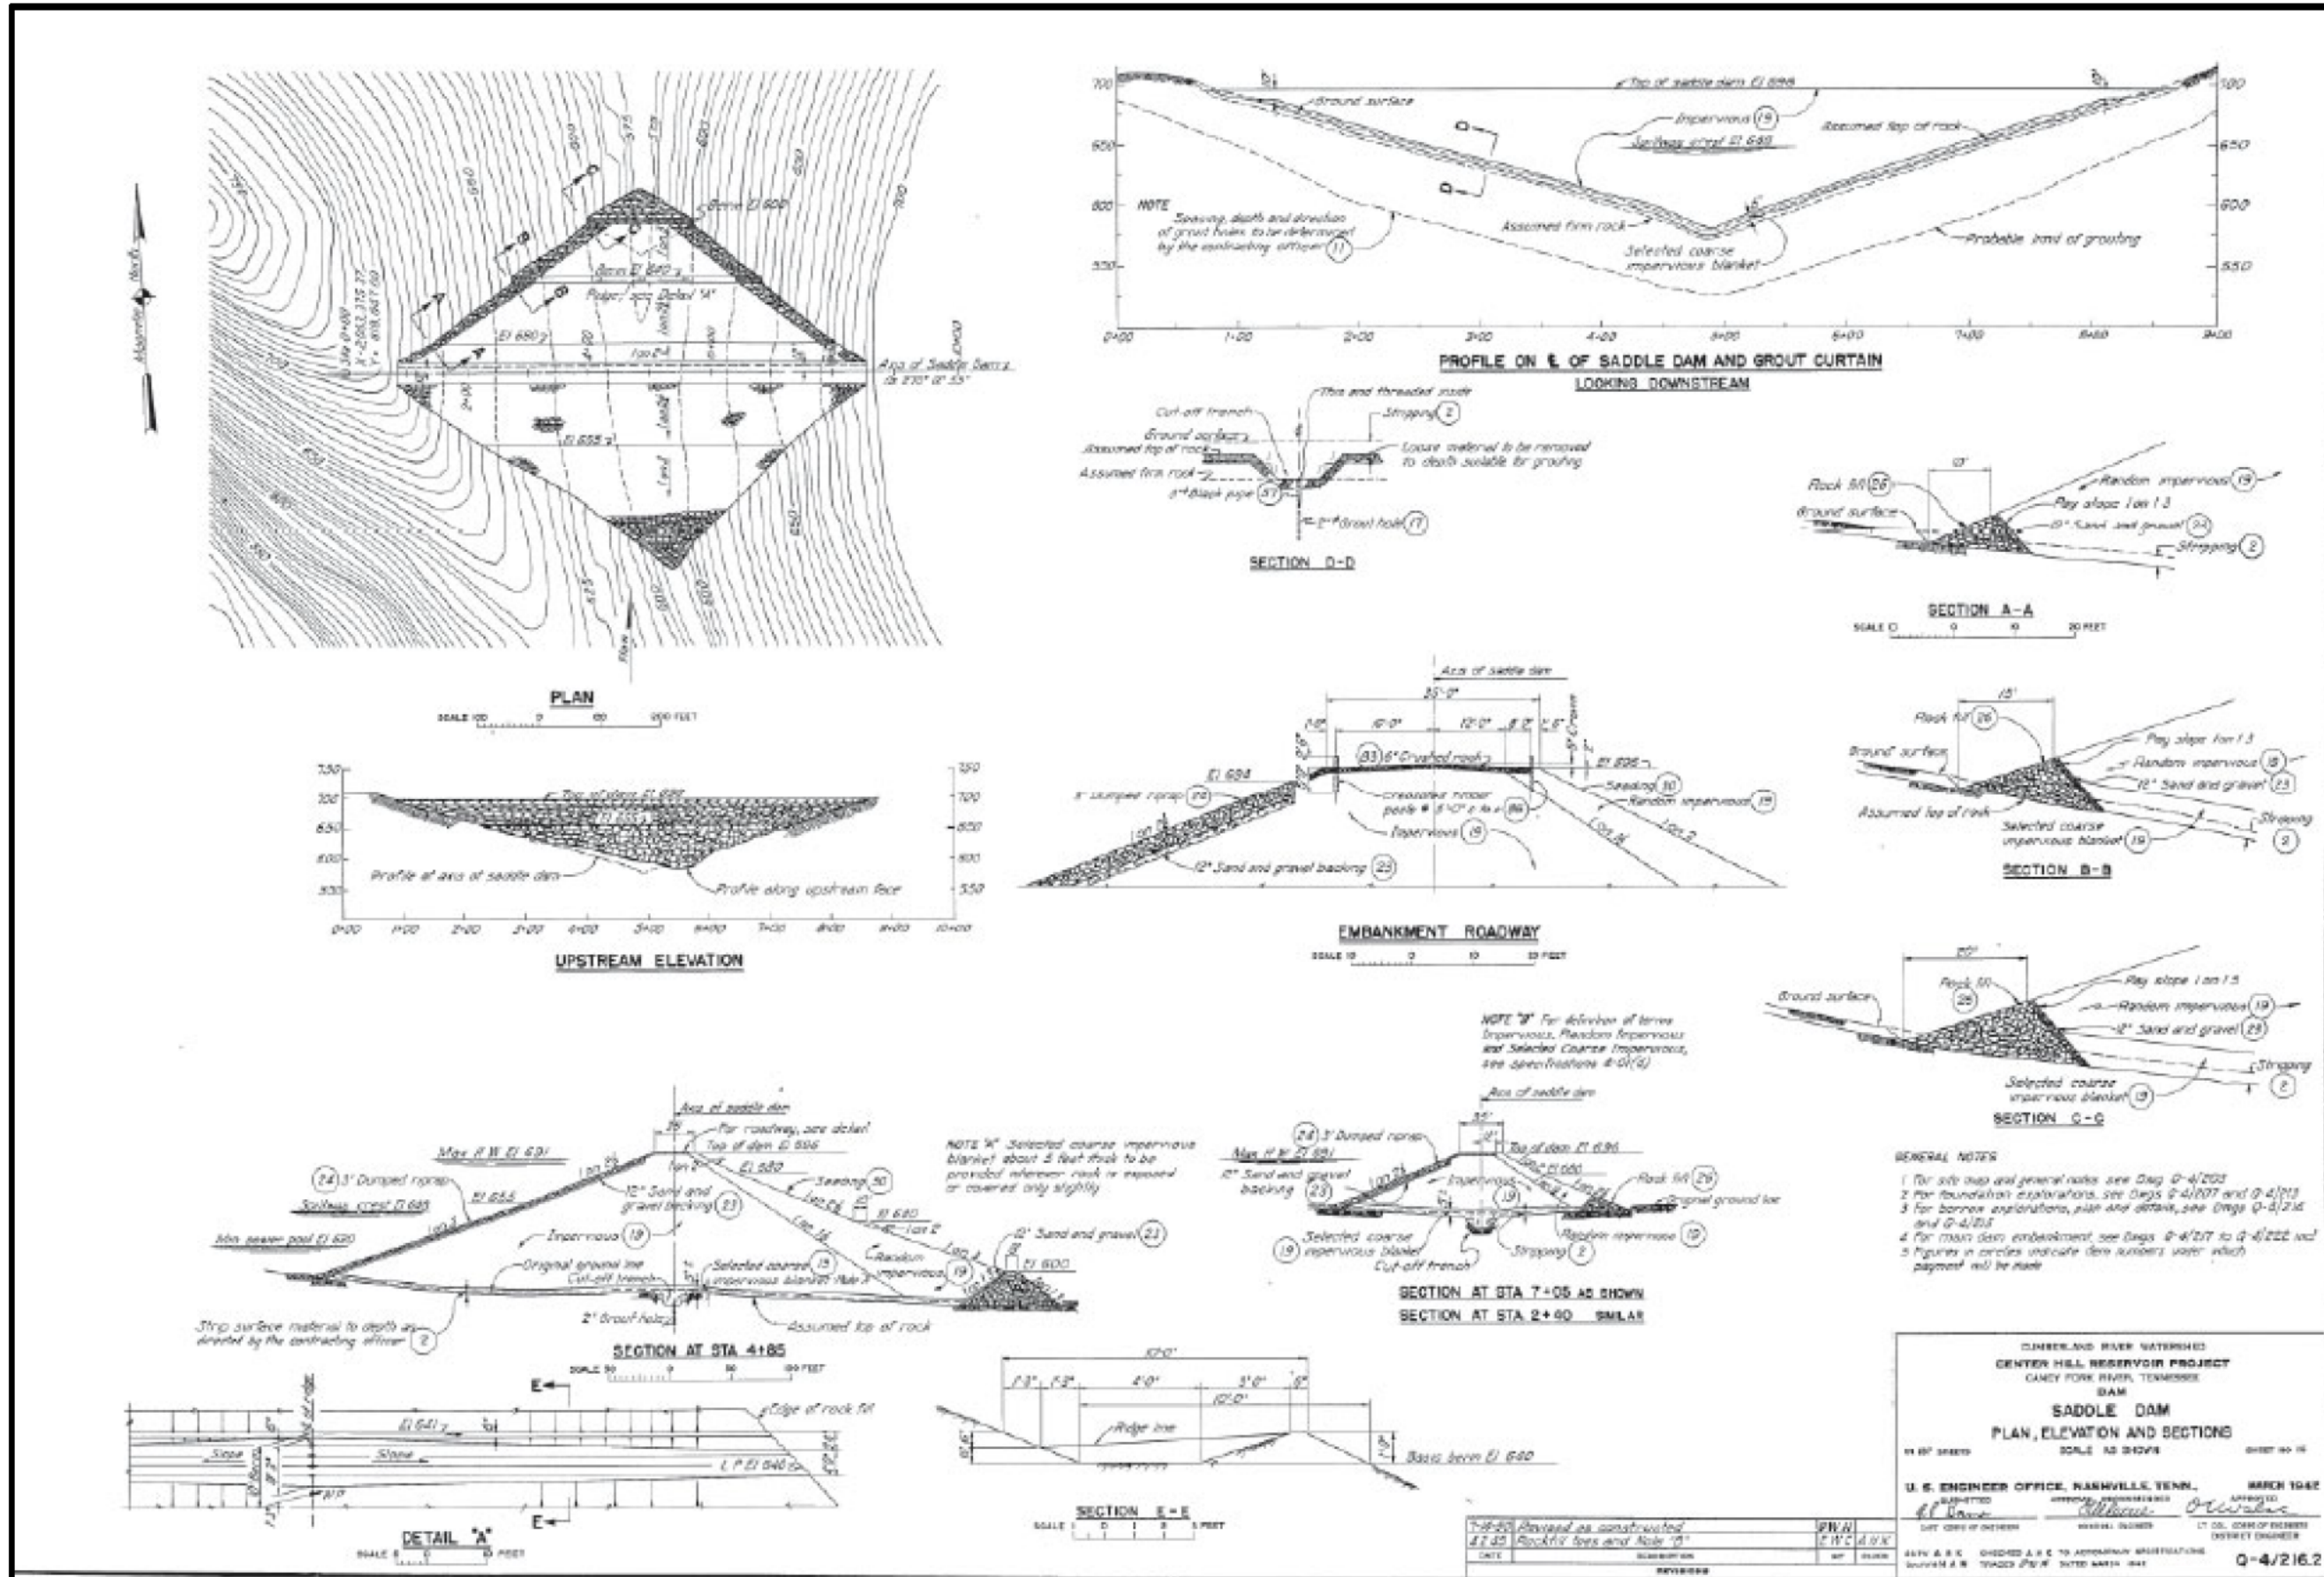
Center Hill Dam, Saddle Dam Plan, Elevation, and Sections.
